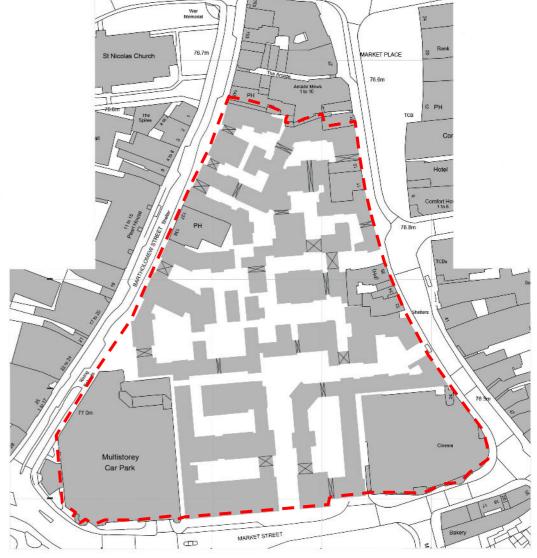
Concept/Proposed Figure-Ground Plan.
